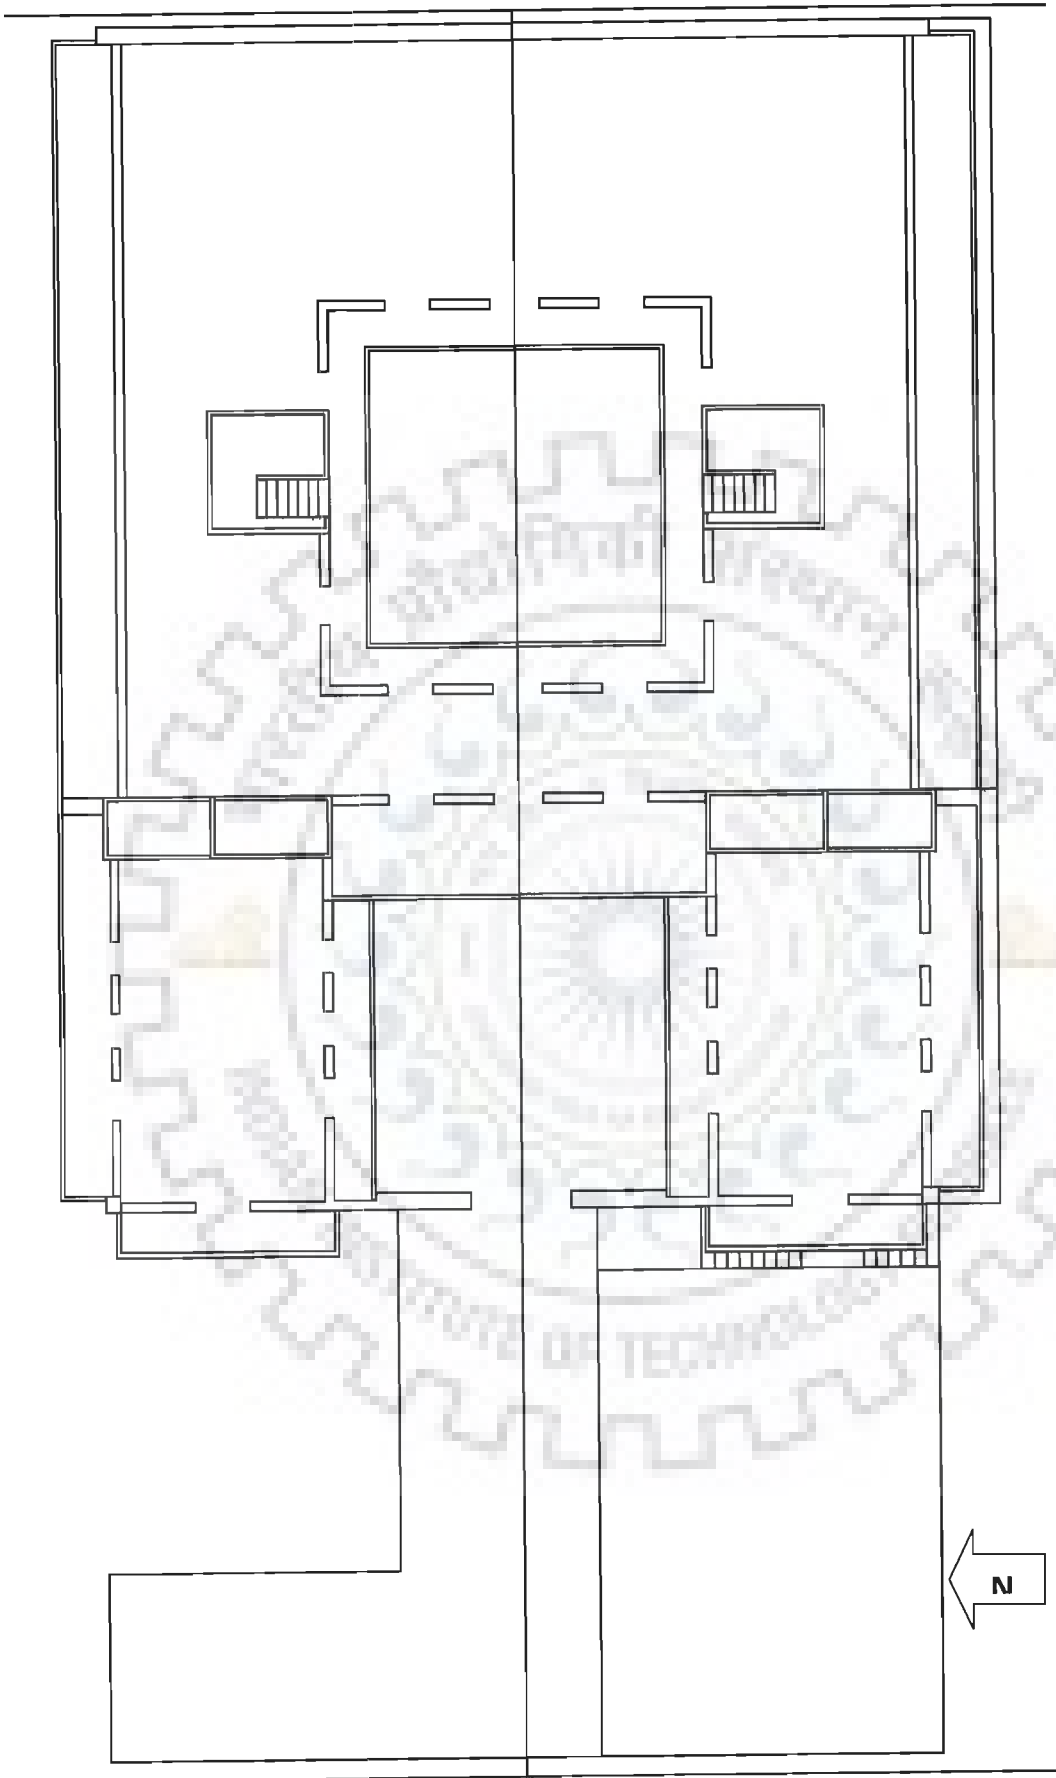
Mezzanine Floor Plan for Upper Ground Level
